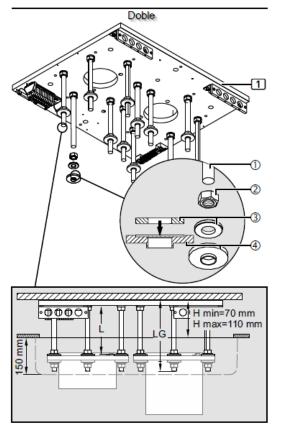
Fitting of the upper insulation to the threaded bolts without a false ceiling
